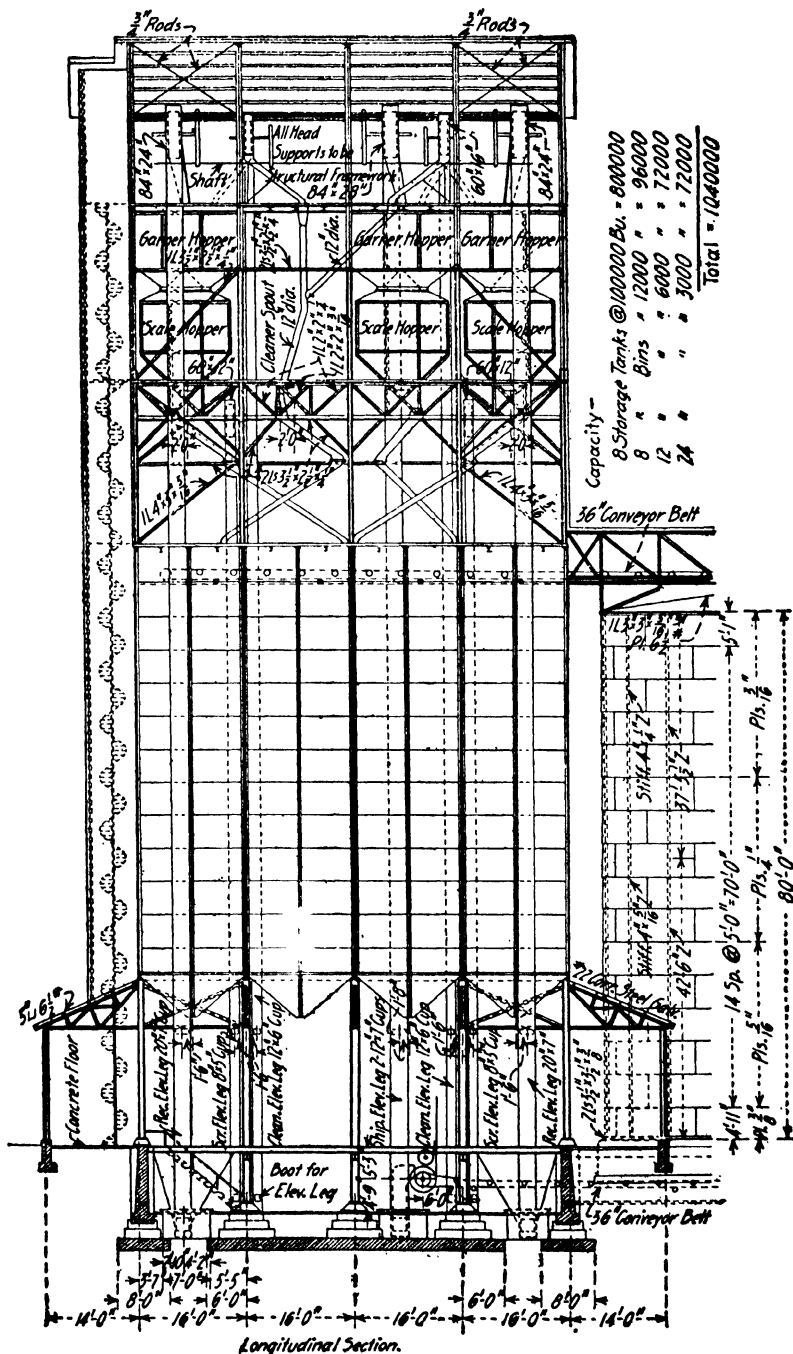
LONGITUDINAL SECTION OF WORKING HOUSE OF INDEPENDENT ELEVATOR.
